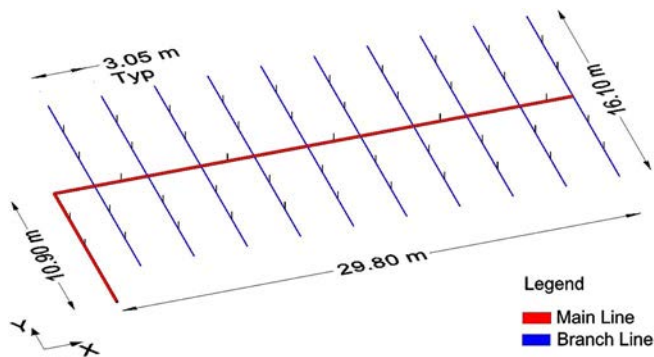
Layout of the black iron threaded fire sprinkler piping system.
